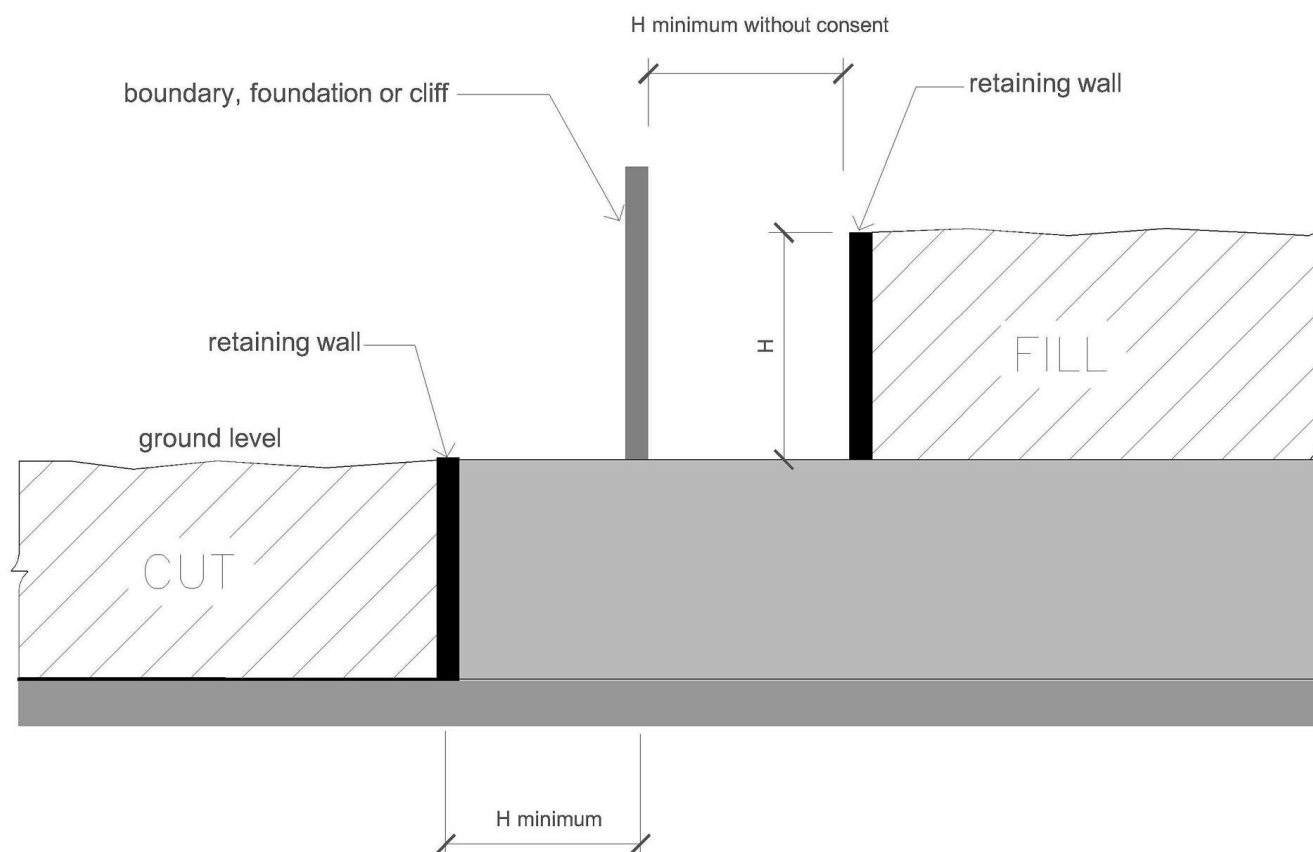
B Cut and fill supported by retaining walls (elevation view)
